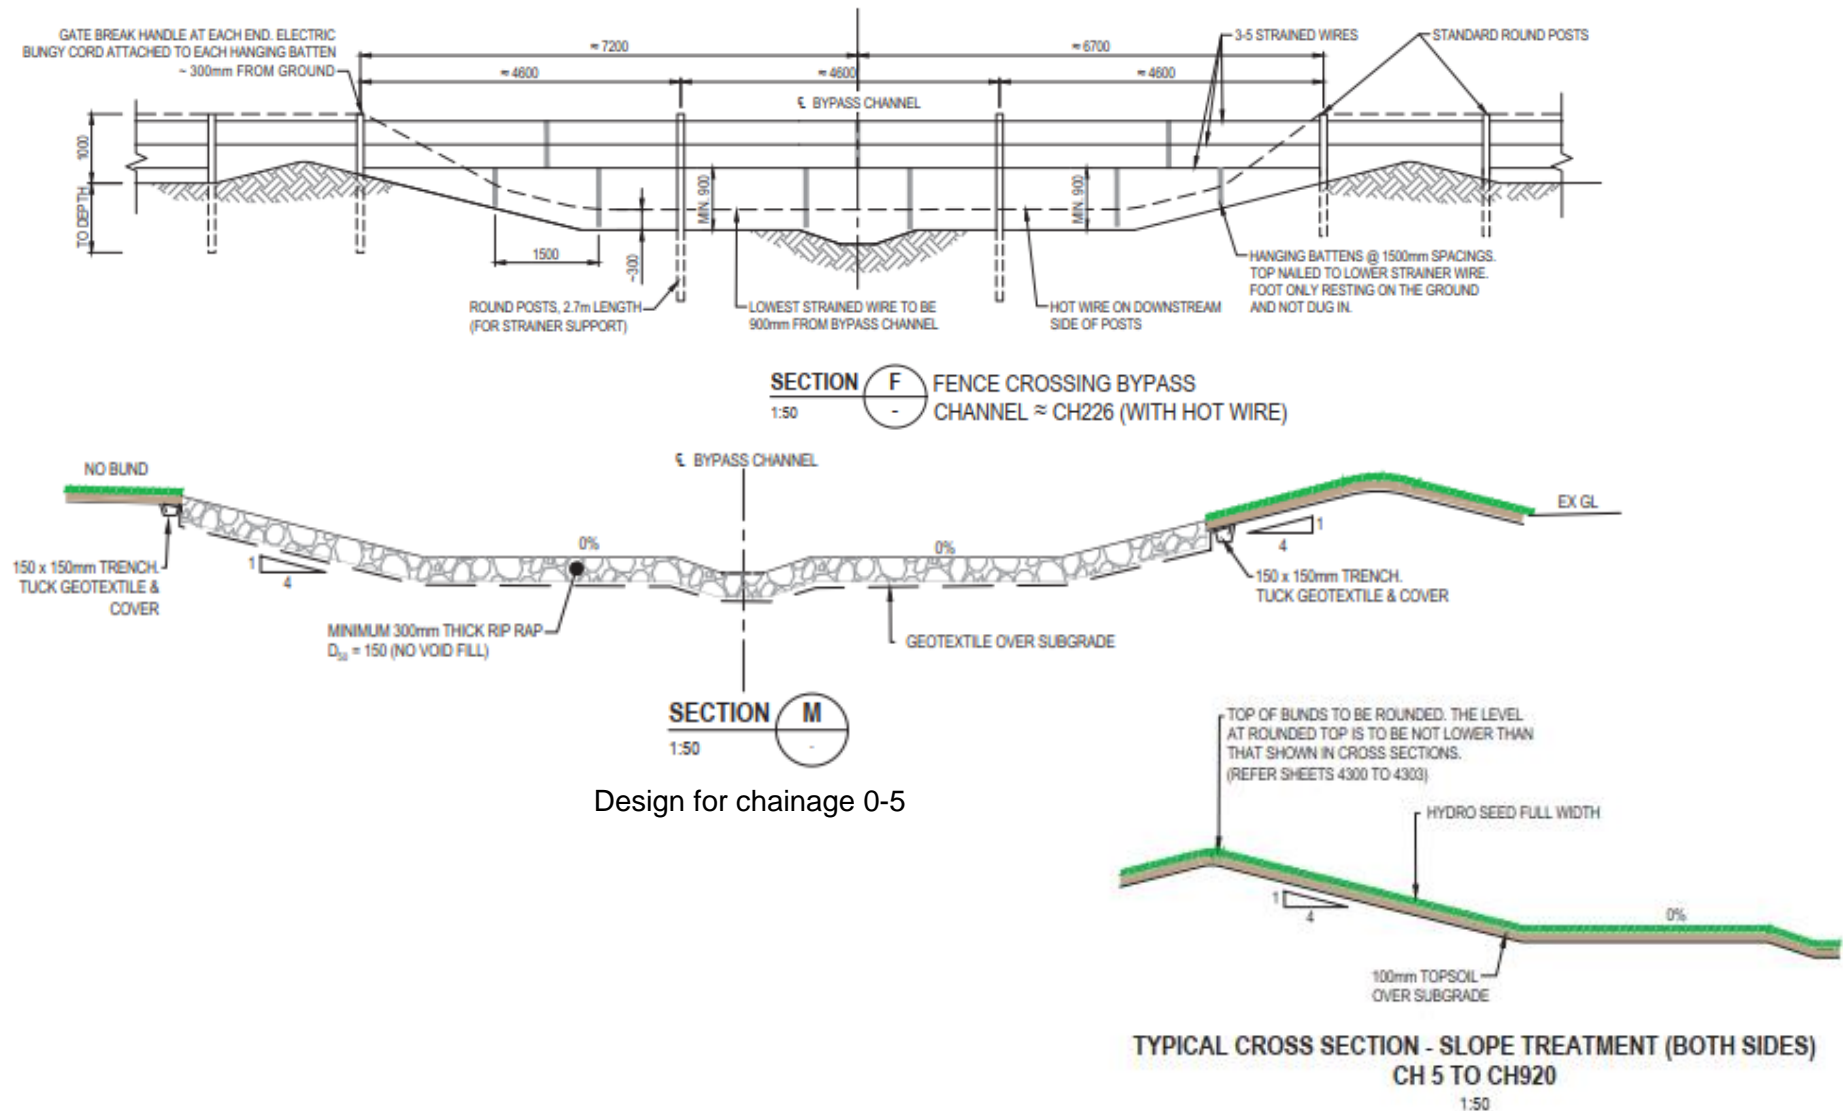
Proposed channel construction details and final surfaces within 60 Leeston Dunsandel Road property boundary
